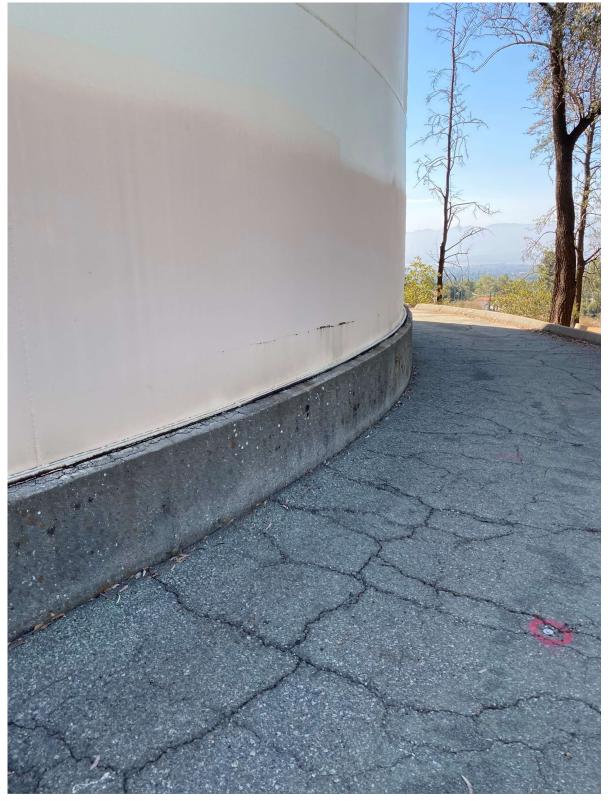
Reservoir Base (surrounding asphalt is cracking and evidence of deterioration)
